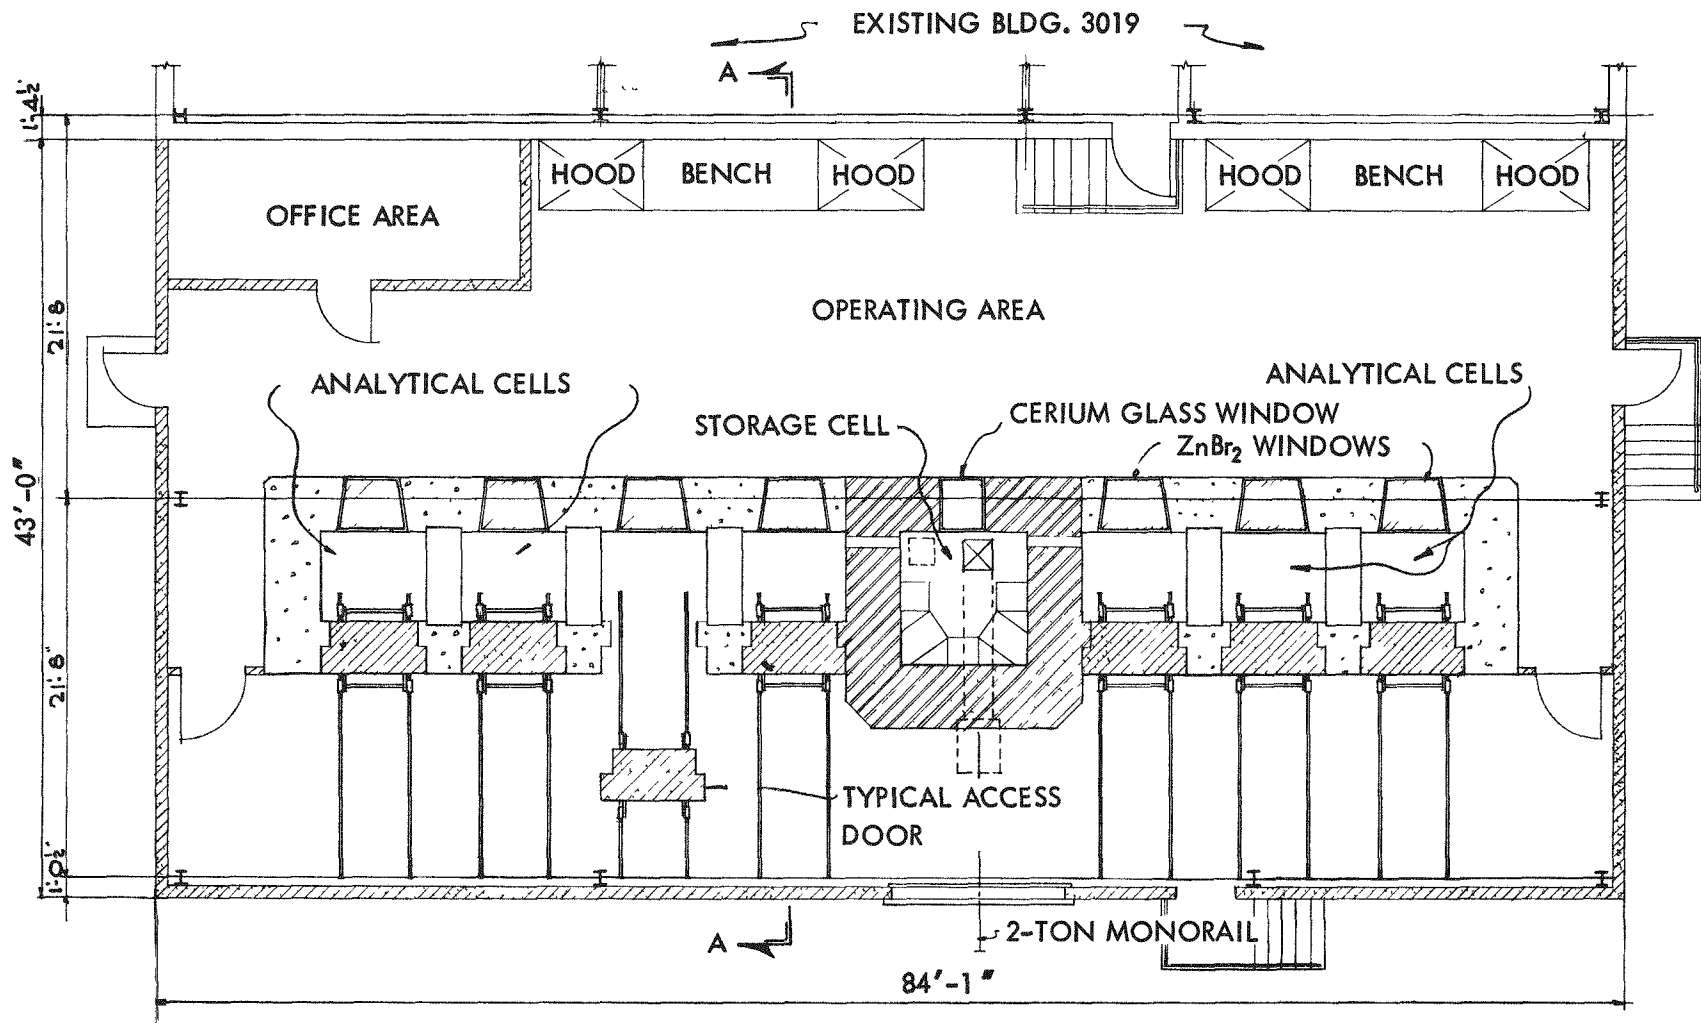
Sectional plan of high-radiation-level analytical facility, Chemical Processing Pilot Plant, building 3019, Oak Ridge. , poured concrete (regular); , poured concrete (barytes);  concrete blocks (regular).
